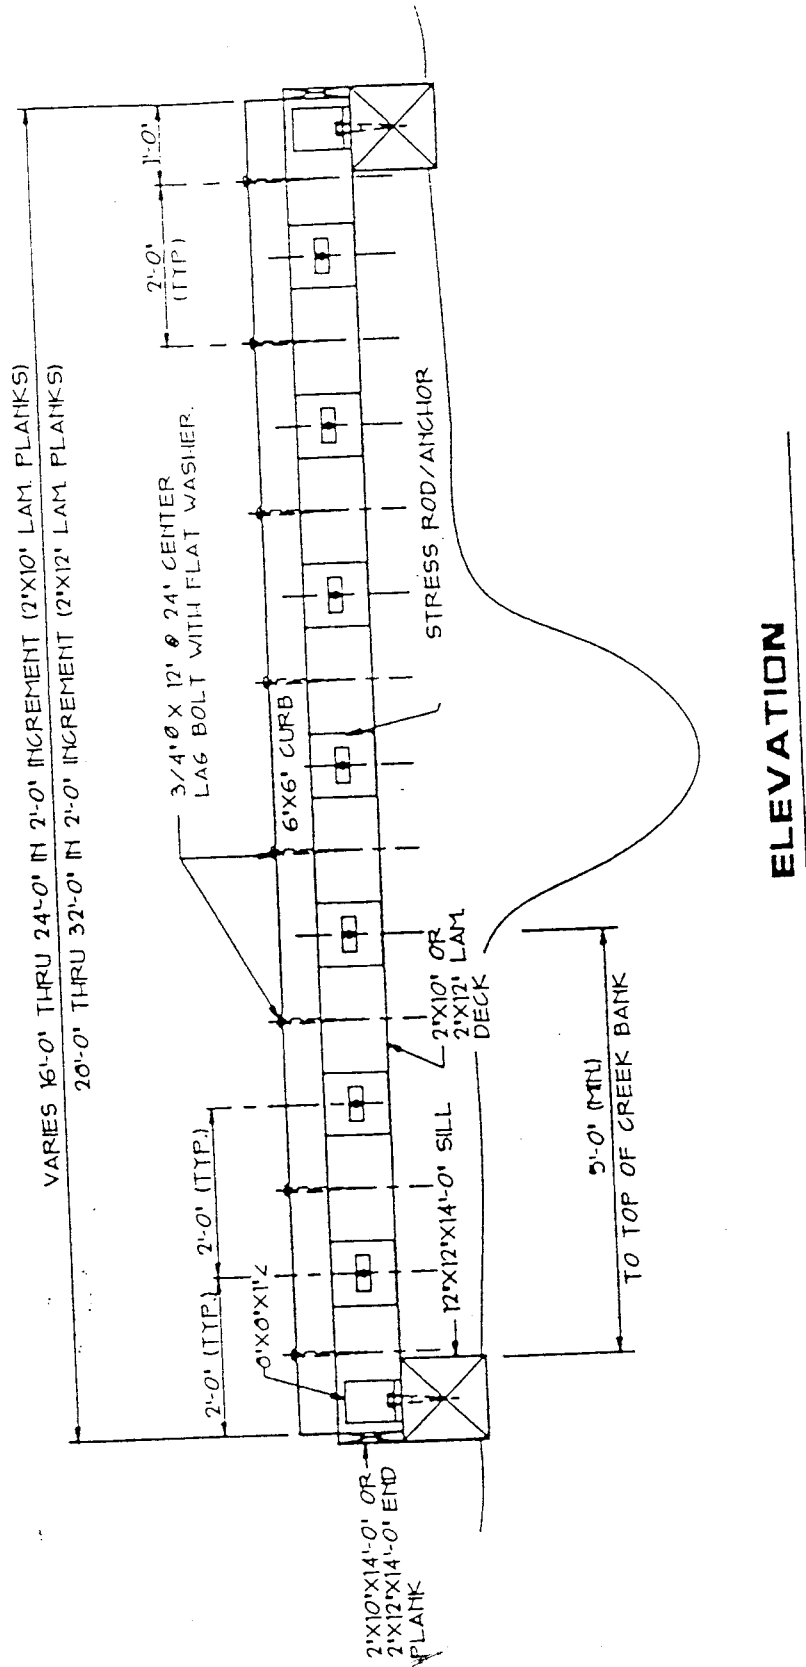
Elevation view of the longitudinal stress-laminated timber deck bridge.
